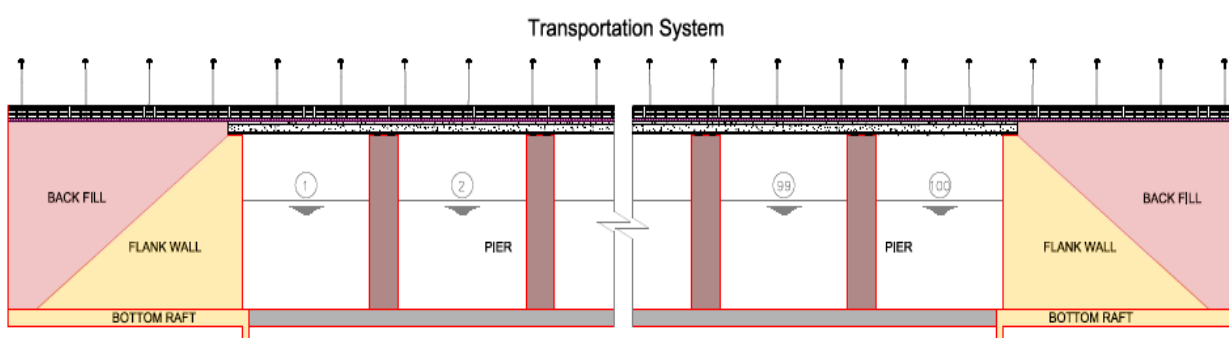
Longitudinal View of Flood Regulator at Flank Wall Section
